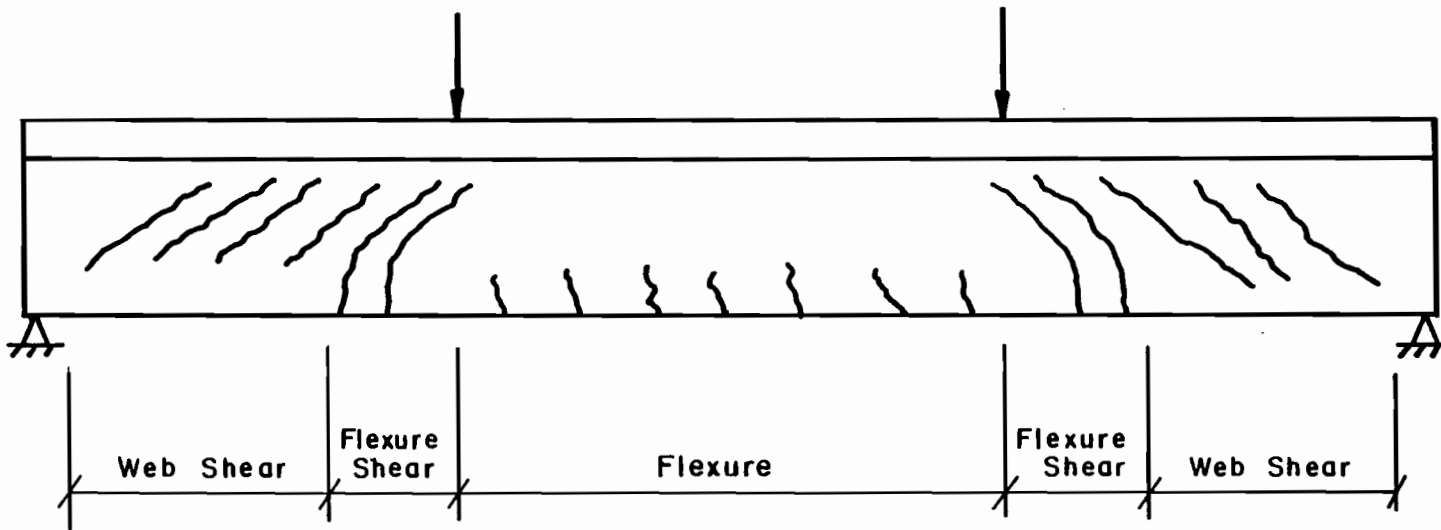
Possible types of cracking in prestressed beams
